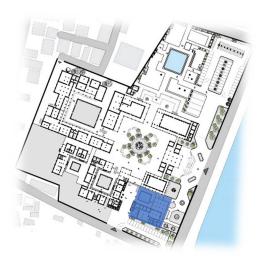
KEY PLAN WITH HIGHLIGHTED RESTAURANT
